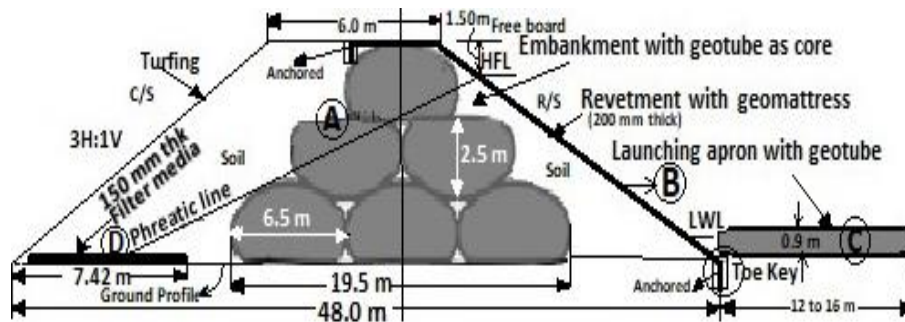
Typical cross section of protection work using geotube and geotubular mattress
